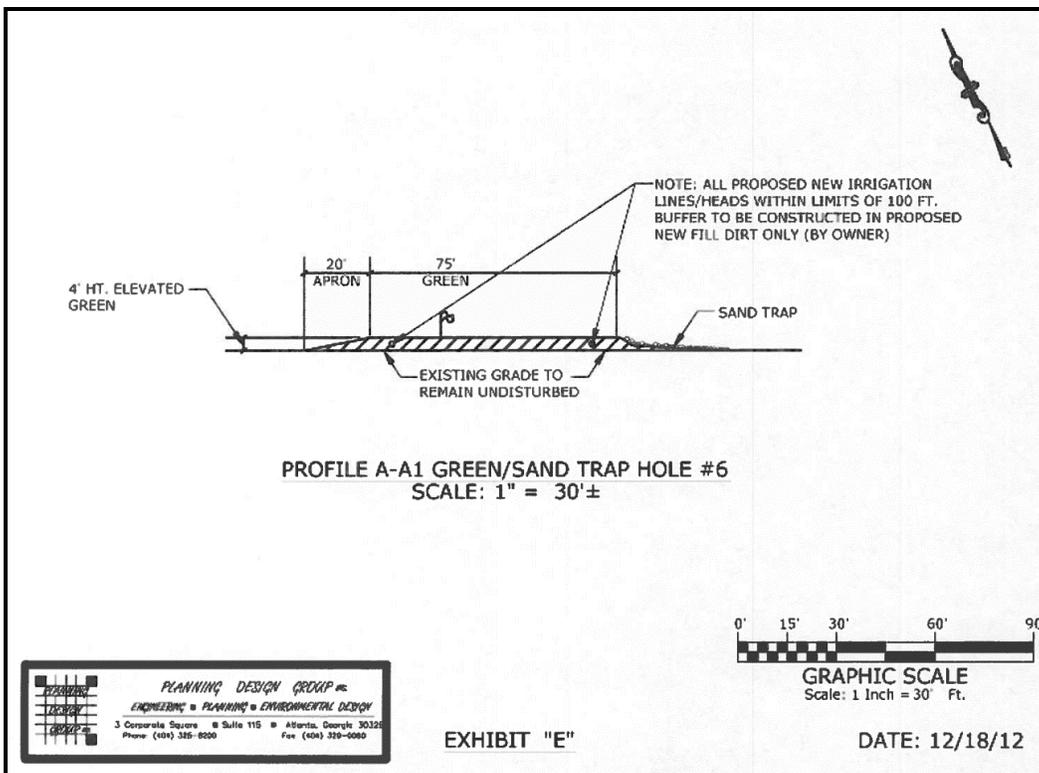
Proposed Improvements in the Area of 9GO59. Cross Section Detail of Hole 6 Cost-to-Cure Construction Plans.
